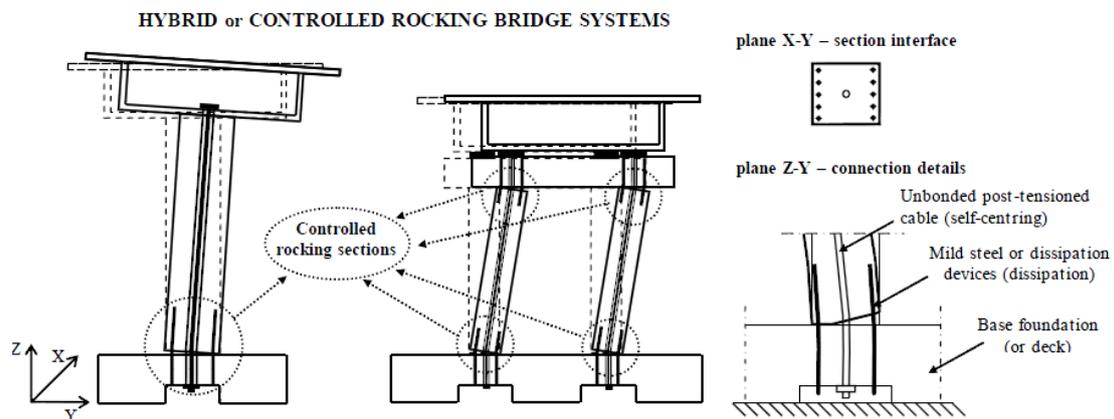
‘Hybrid’ or ‘controlled rocking’ solutions for bridge piers (Palermo & Pampanin 2008)
